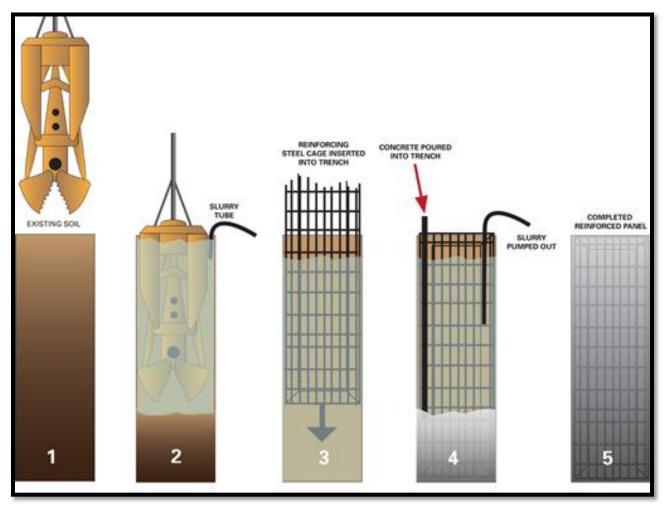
Stages of a Slurry Wall | Courtesy of Massachusetts General Hospital
